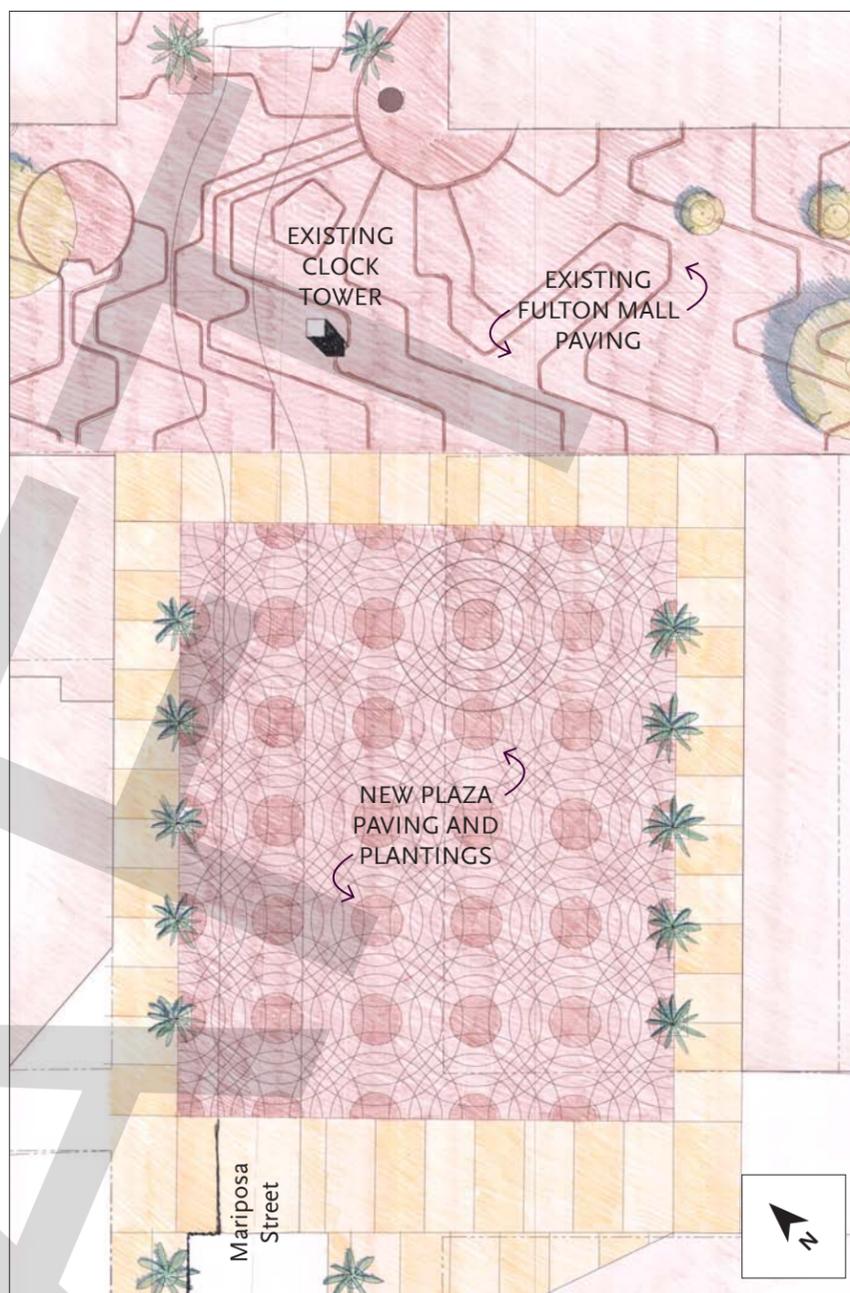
B - Mariposa Plaza - Landscape plan showing paving, plantings, and one illustrative example for the vision of the plaza
